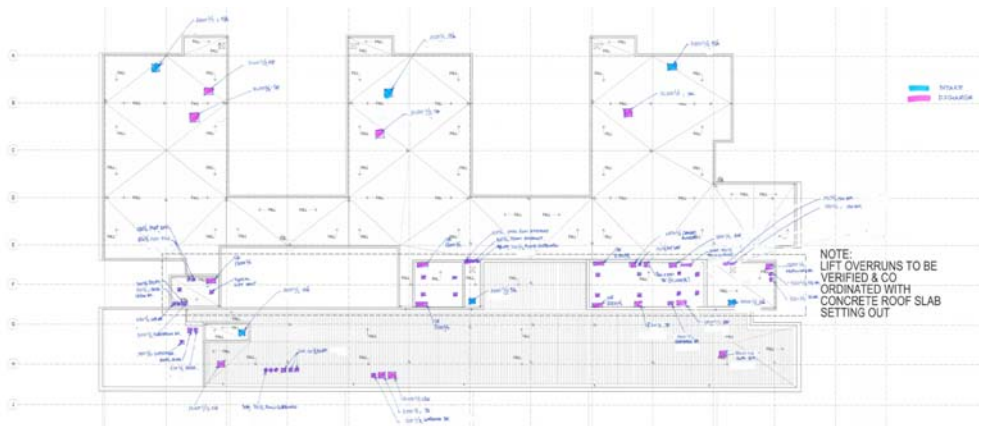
Level 10 floor plan, Acute building with intakes highlighted in blue
